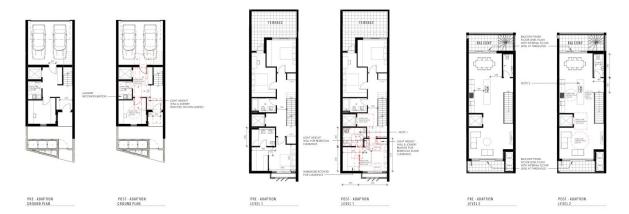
Townhouse Type B1 - Adaptable 3 bed unit
